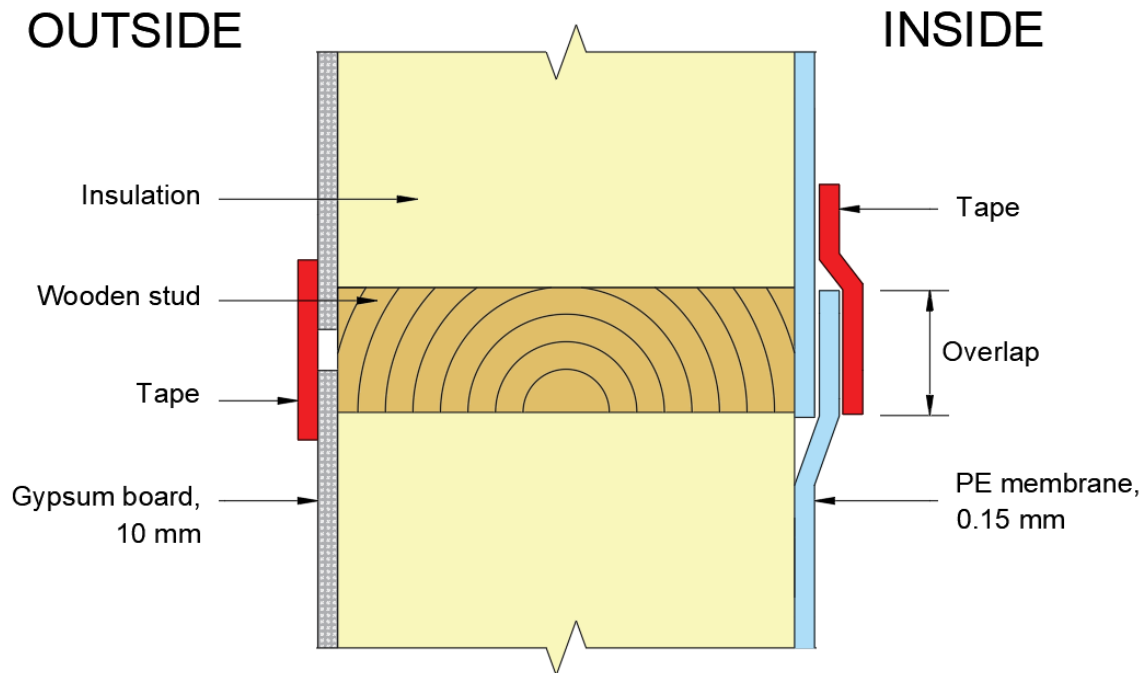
Cross-section of an exterior wall showing a simple tape connection of boards (left) and overlapping membranes with single-sided tape (right).
